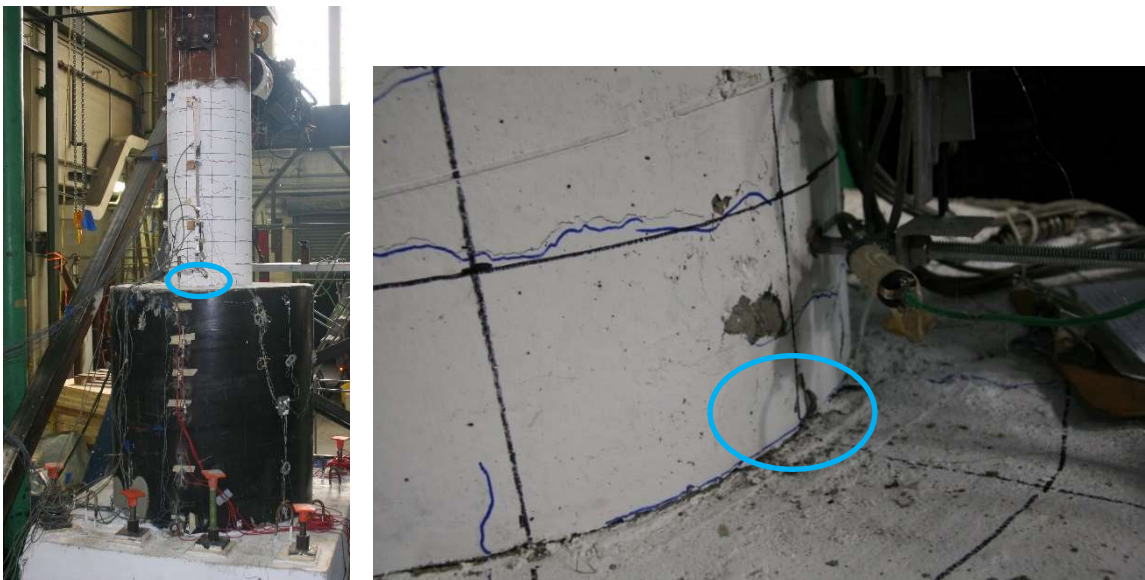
Specimen 48-21 Column Interface crack at 1.8% Drift
